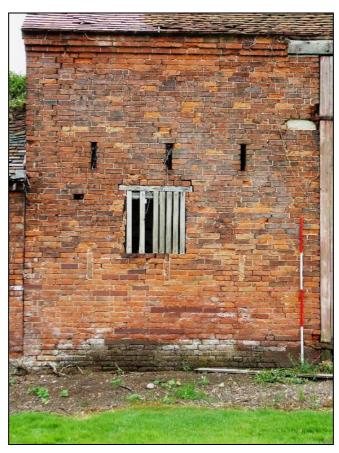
Northern bay of the west elevation, looking east (scale 2m).
